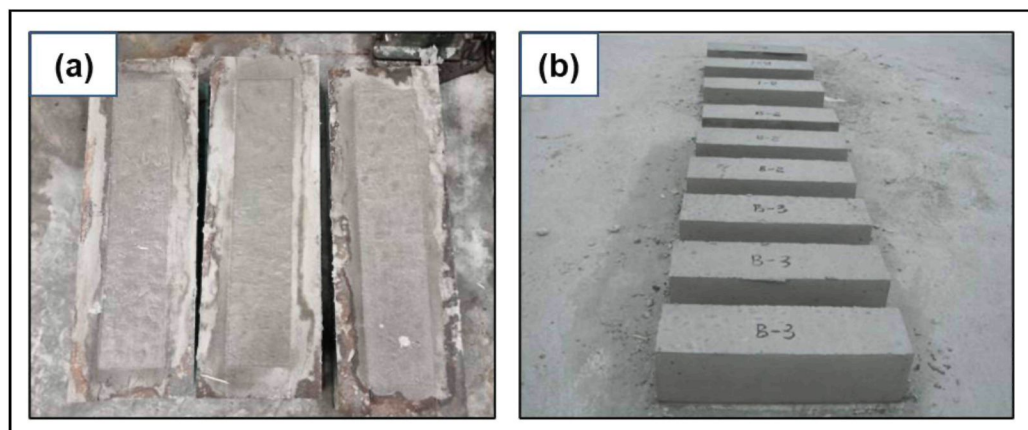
(a-b) The Grade 30 Concrete Beam Specimens Prepared For The  $f_s$  Test
